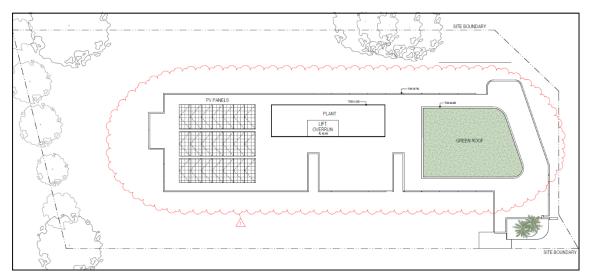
Previous hotel roof plan (DA-105, Issue E)
